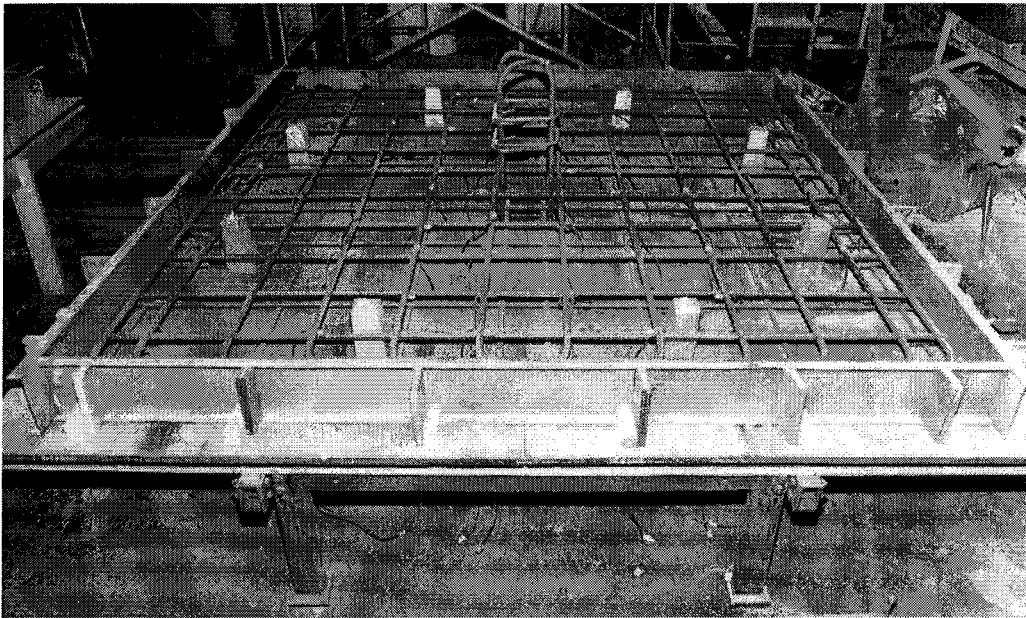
Top Reinforcement and Gauge Layout : Slab NEF-1
